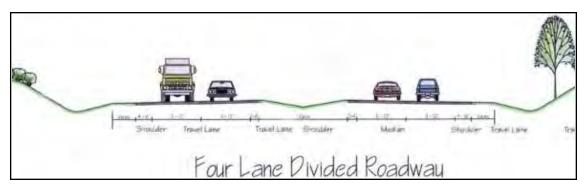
Cross-Section of a Four-Lane Divided Roadway for Draining of Road Runoff<sup>11</sup>
